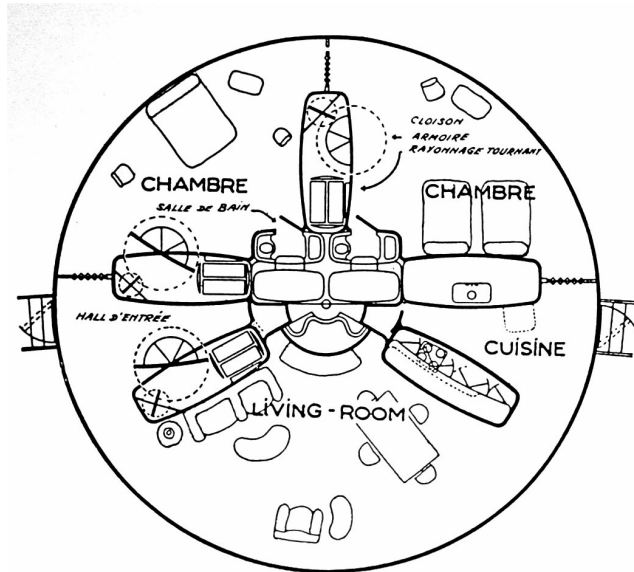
Floor plan of Wichita House (*L'Architecture d'aujourd'hui*, n° 6, 1946, p.78)
